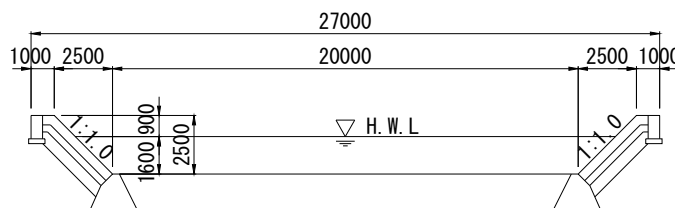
Design river cross section (Gogecha Bridge)
